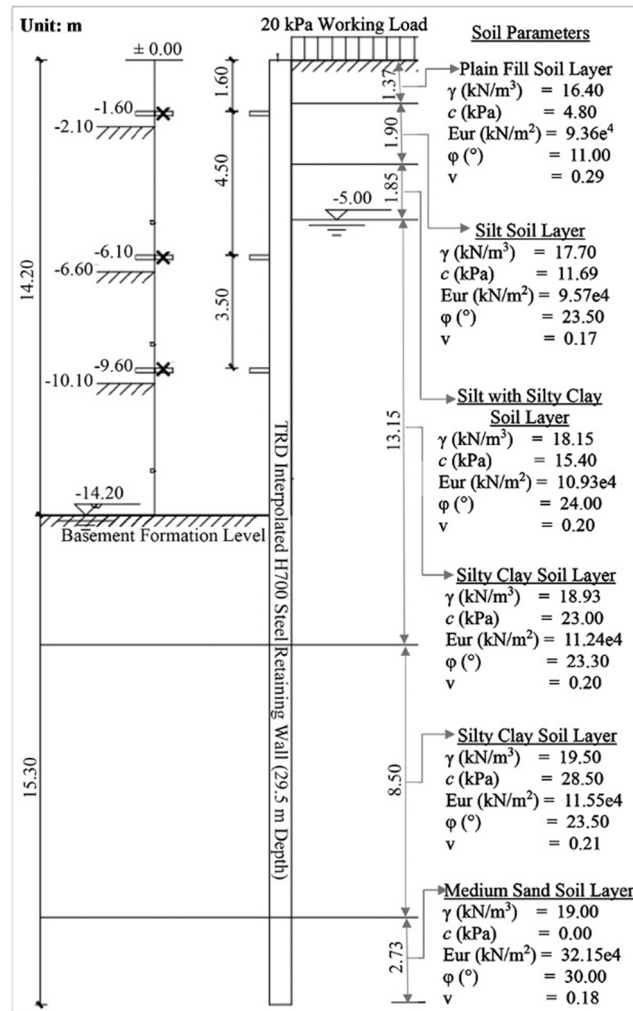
Triumph Unit building block basement excavation pit cross-section view.
